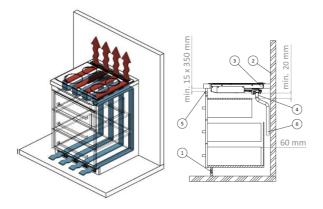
Dimensions and method of mounting the GPC Gen.2'5 with safe zones marked
